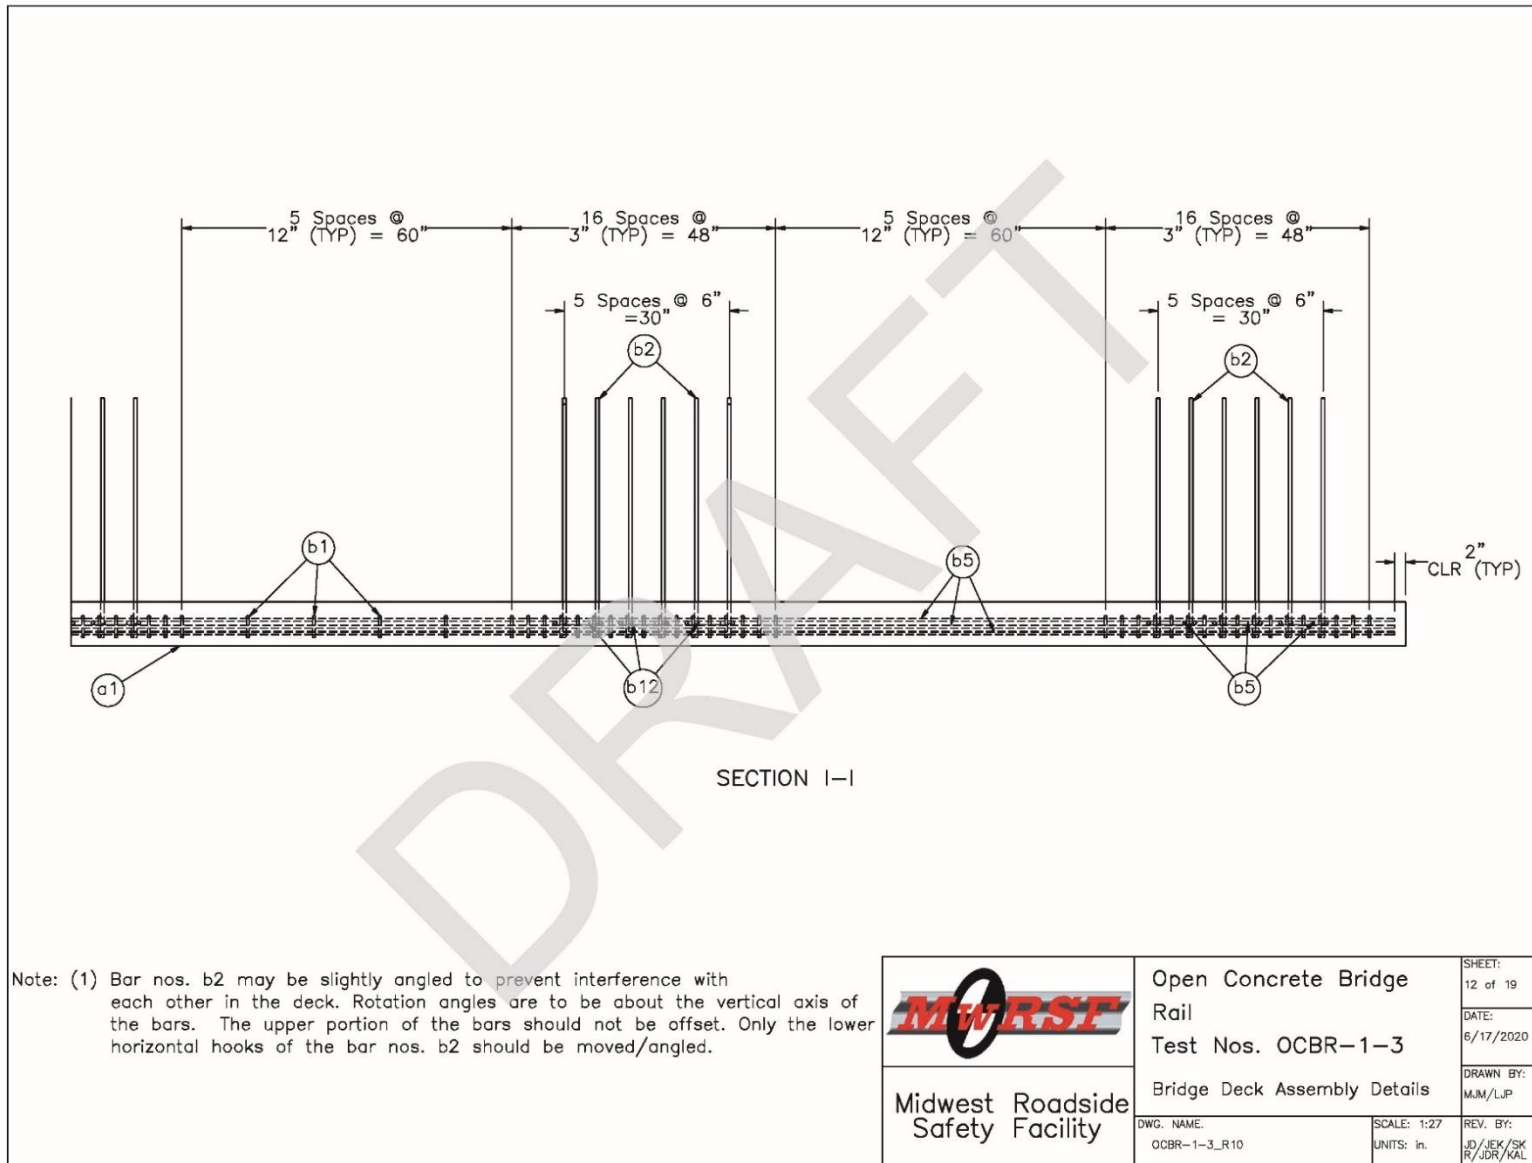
Open Concrete Bridge Rail Bridge Deck Assembly Details
